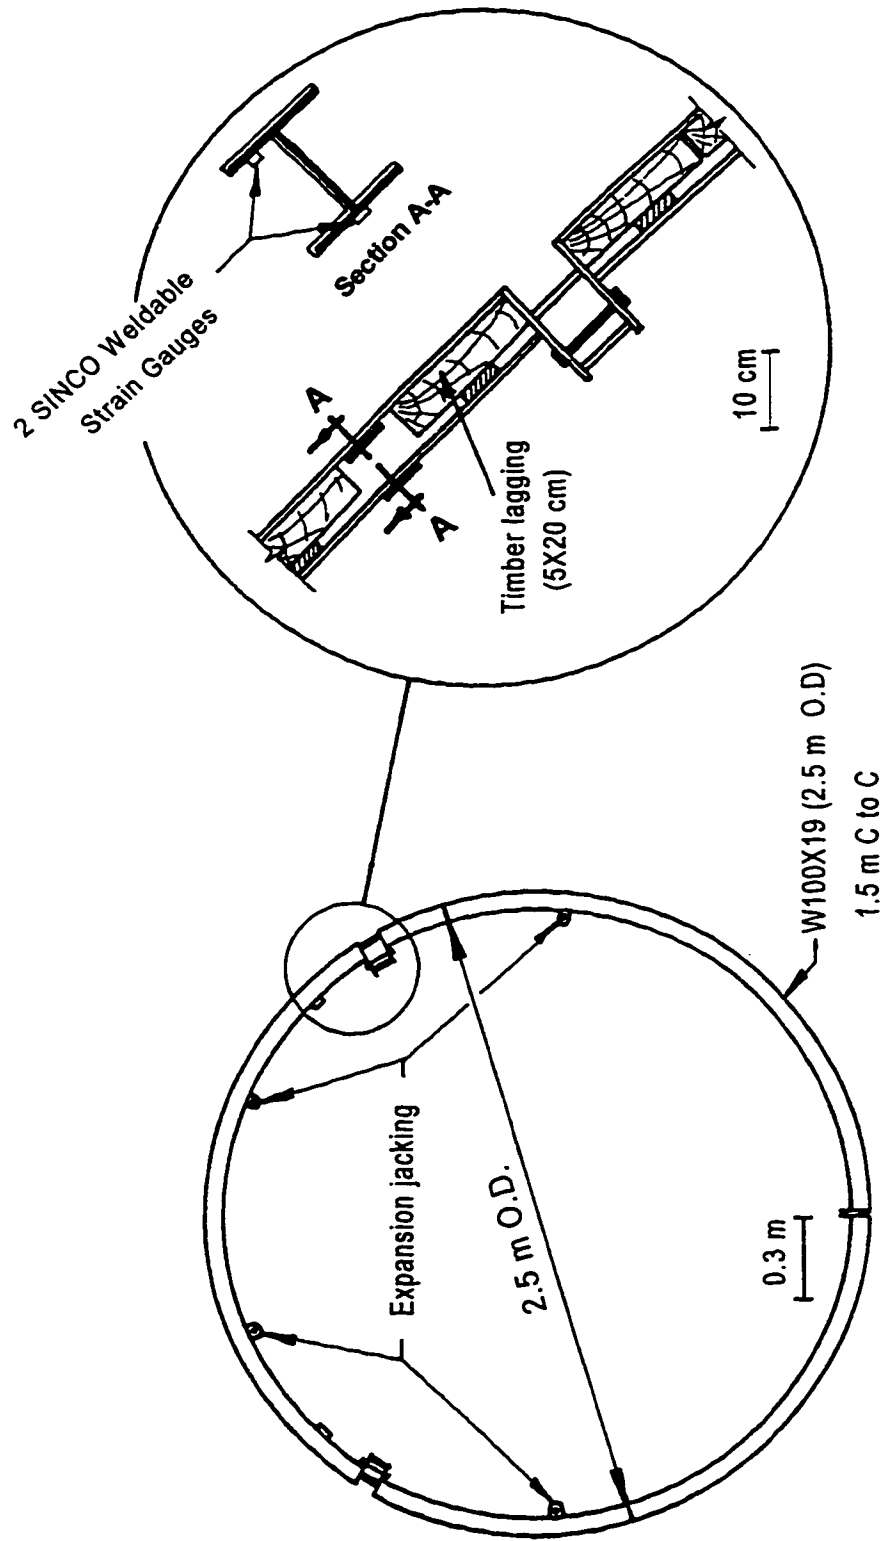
Instrumented Steel Rib of Test Section 1 of Experimental Tunnel
